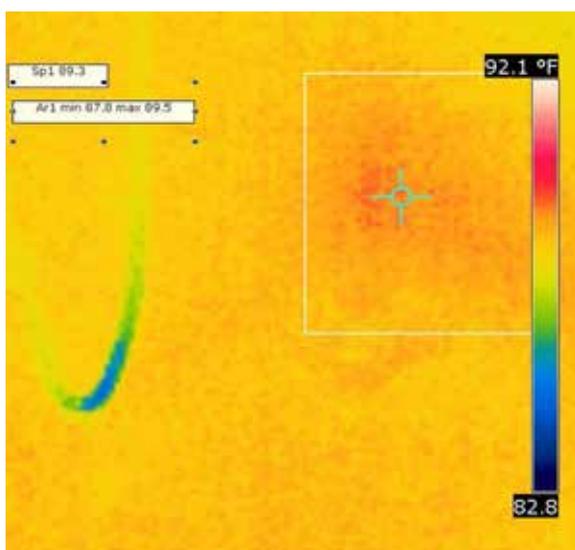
1st floor bath room near Nahani trap south wall joint
